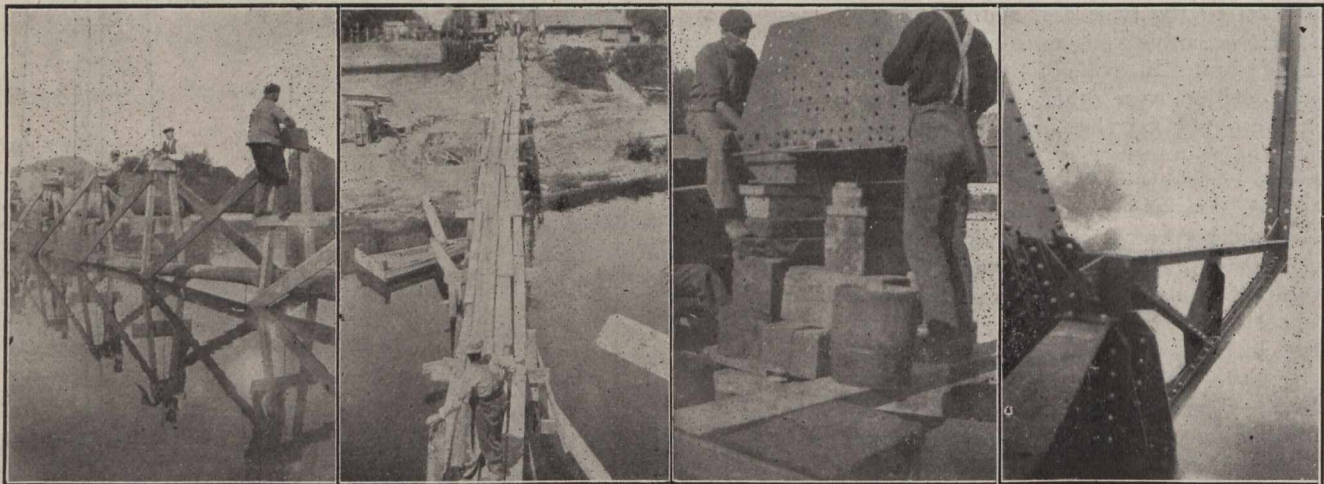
Views of Bridge Construction—Method of Placing 10-in. C.I. Water Main—Chute for Transporting Concrete to Piers—Rivetting a Bottom Chord Splice—Sidewalk Cantilever Adjustment.
